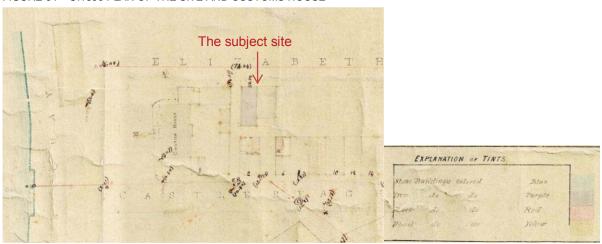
C.1856 PLAN OF THE SITE AND CUSTOMS HOUSE
